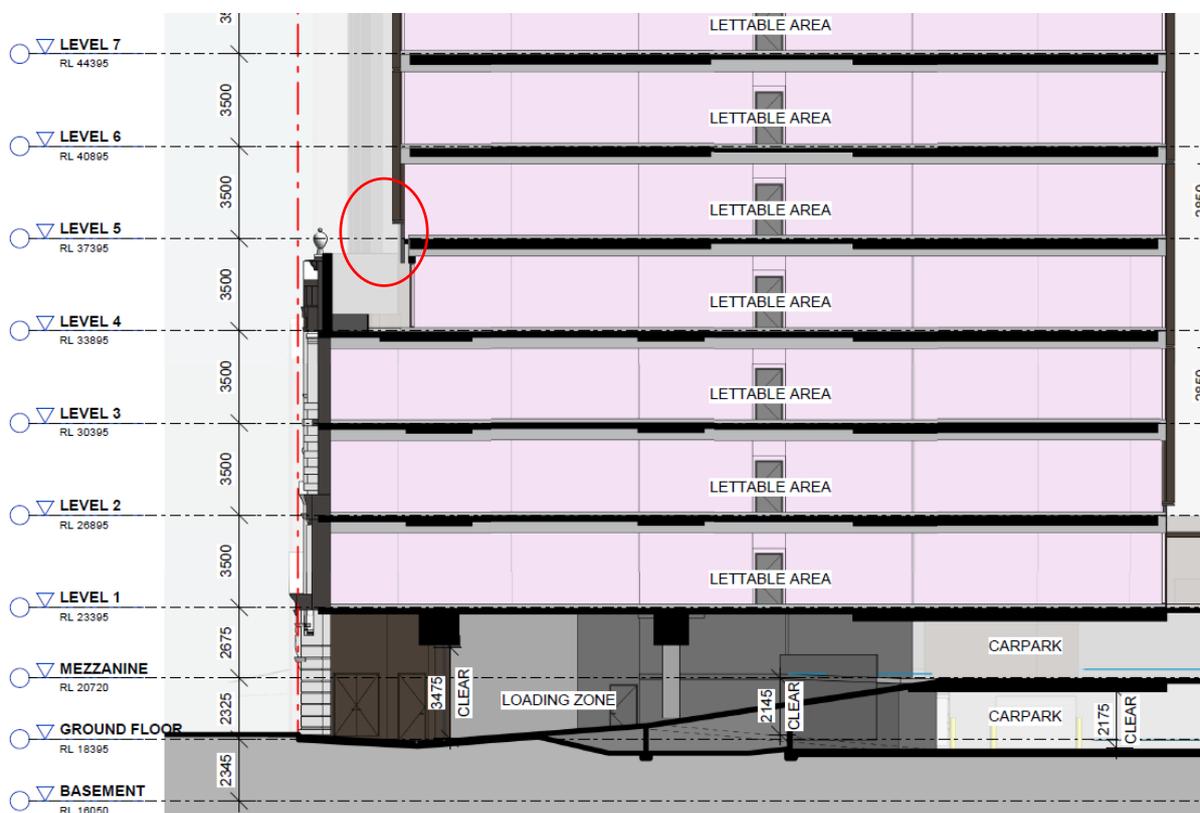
Proposed section plan and location of shadow line, recommended to be shifted upwards to Level 6.
